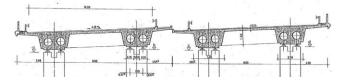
Design drawing of the ribbed slab deck structure (cross section)
